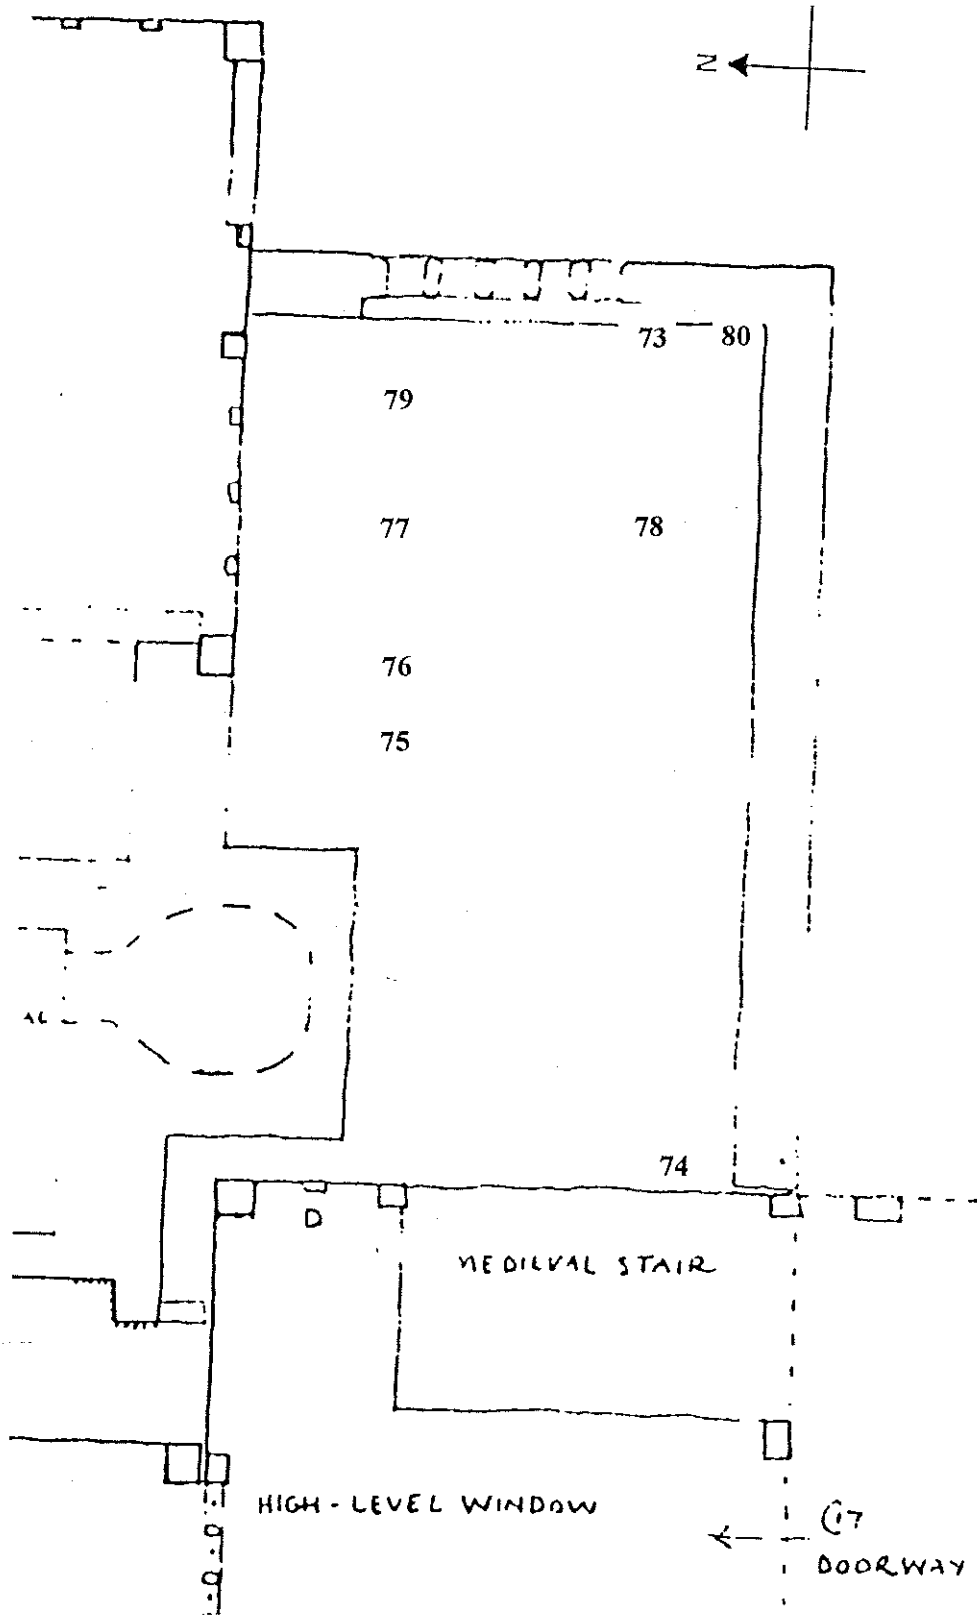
Plan to show location of samples from the open hall and cross-wing
